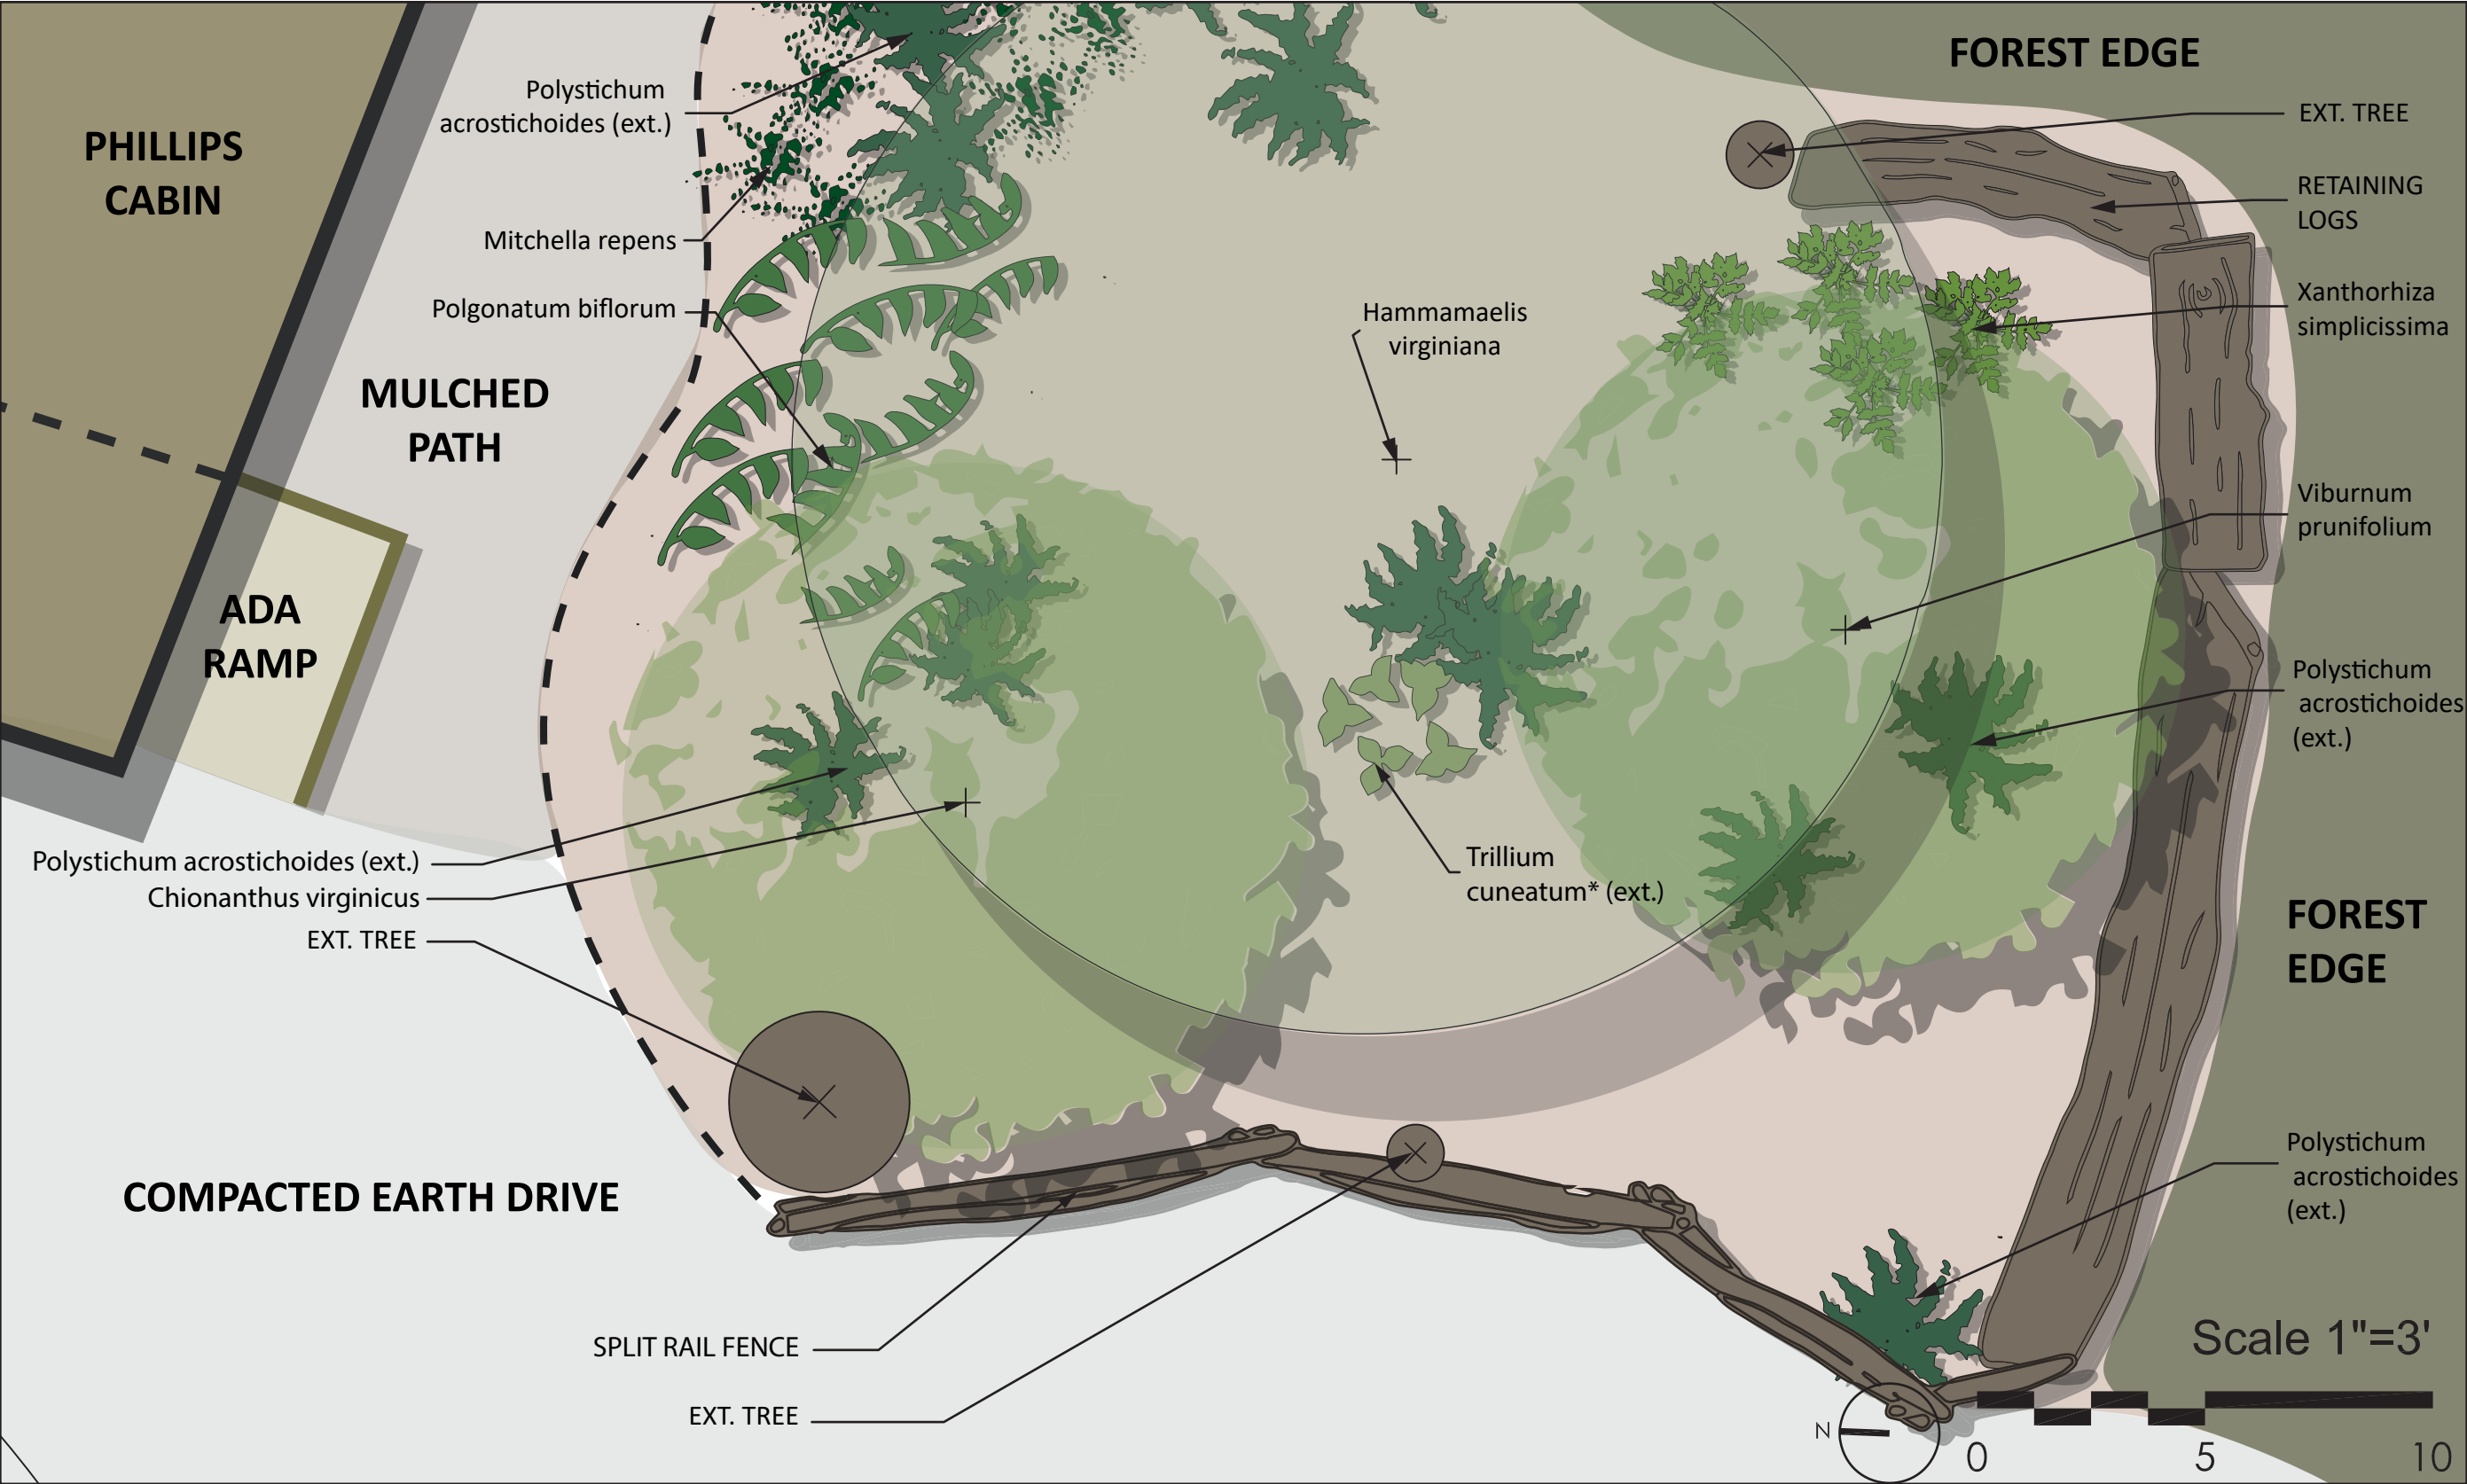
As-Built Planting Plan Plot 2 (Image by author)
